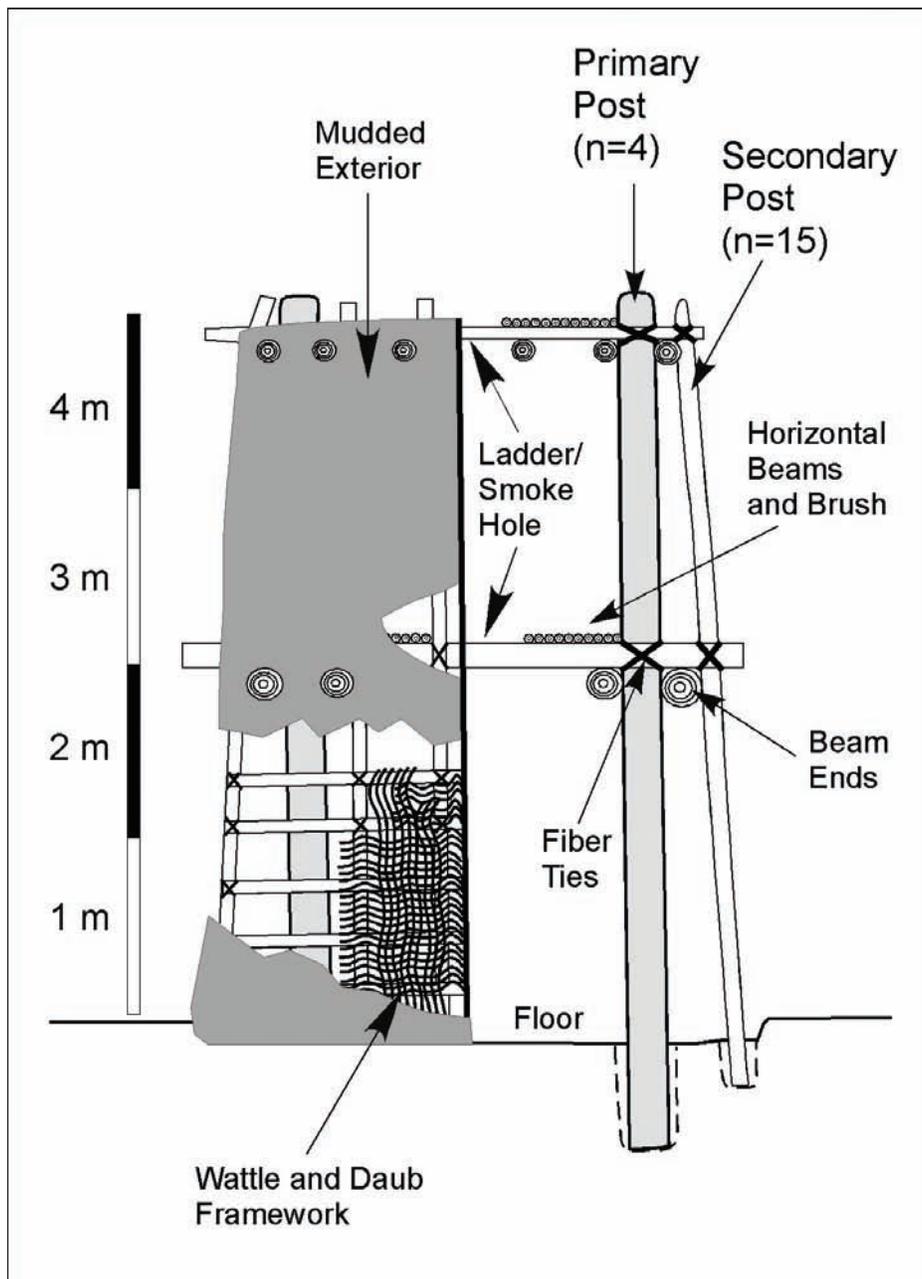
Cutaway view showing the proposed construction of Feature 16 at the Sacred Ridge site.
